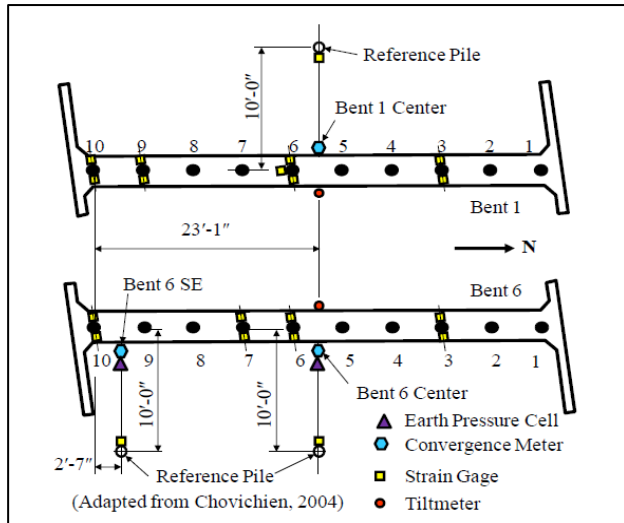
Plan view of bridge Instrumentation (Chovichien, 2004)
